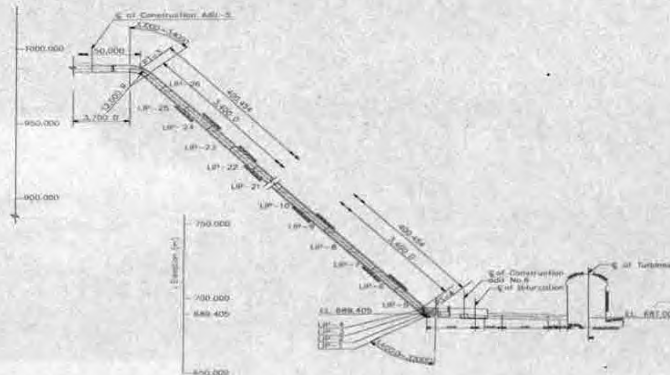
Lower Inclined and Lower Horizontal Penstock
